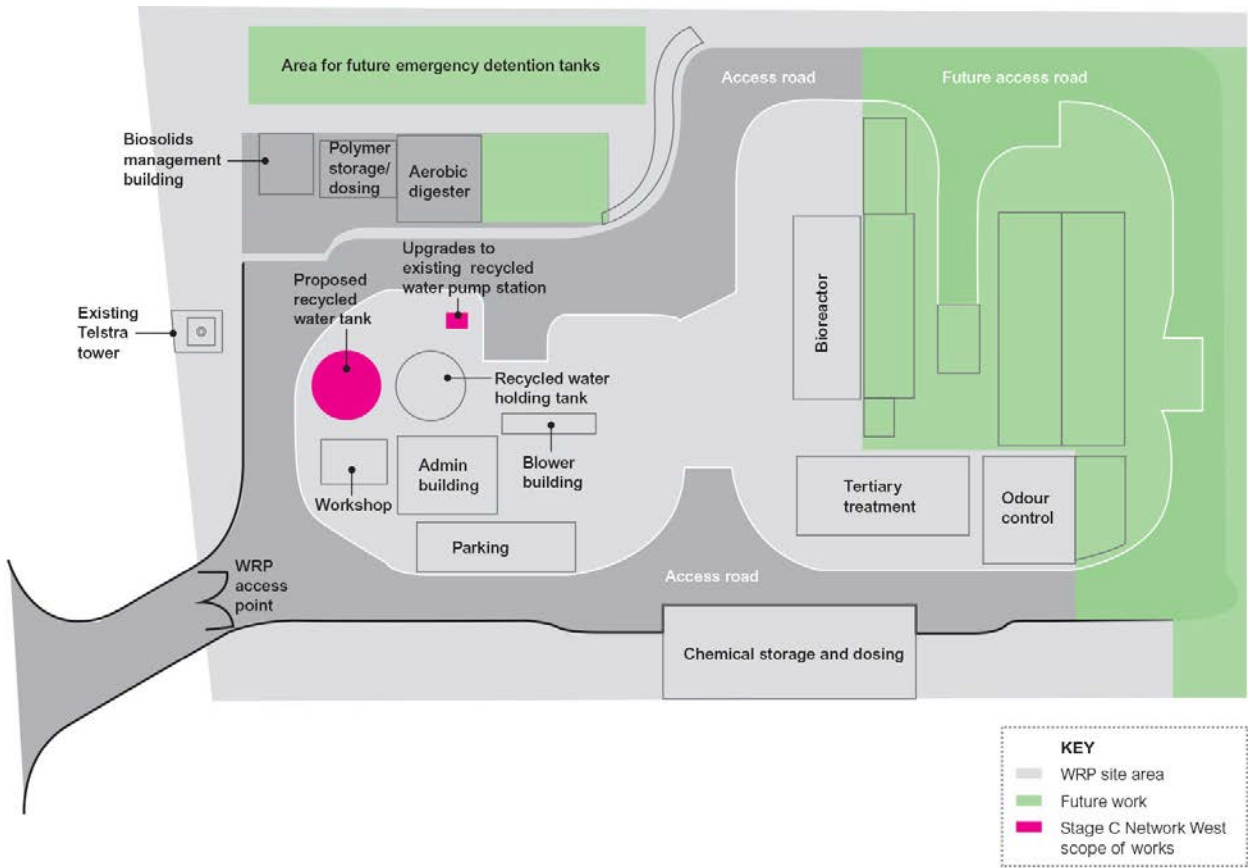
Water Recycling Plant layout – Stage C Network West works
